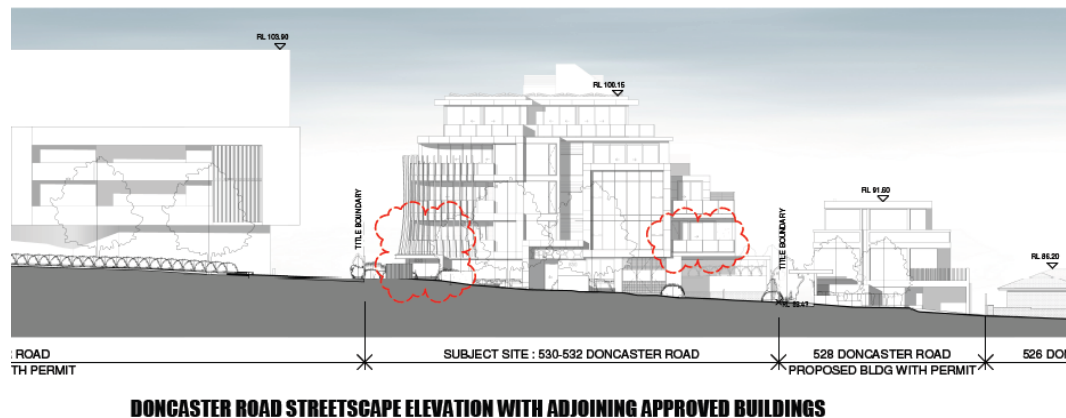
Streetscape elevation of approved buildings adjacent to the proposal
